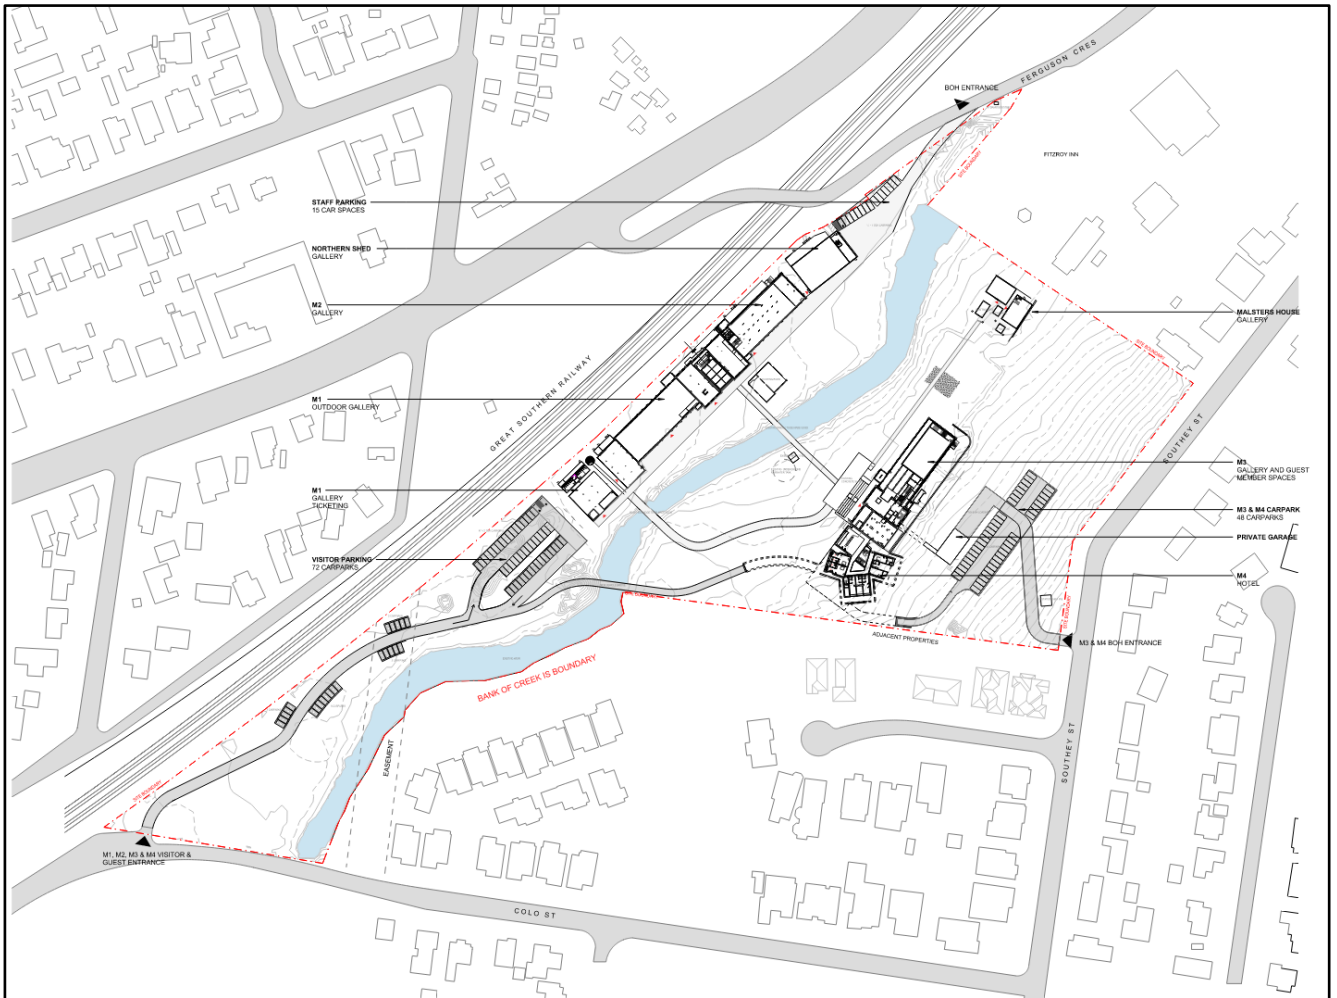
Proposed Site Plan (Snohetta, December 2023)
